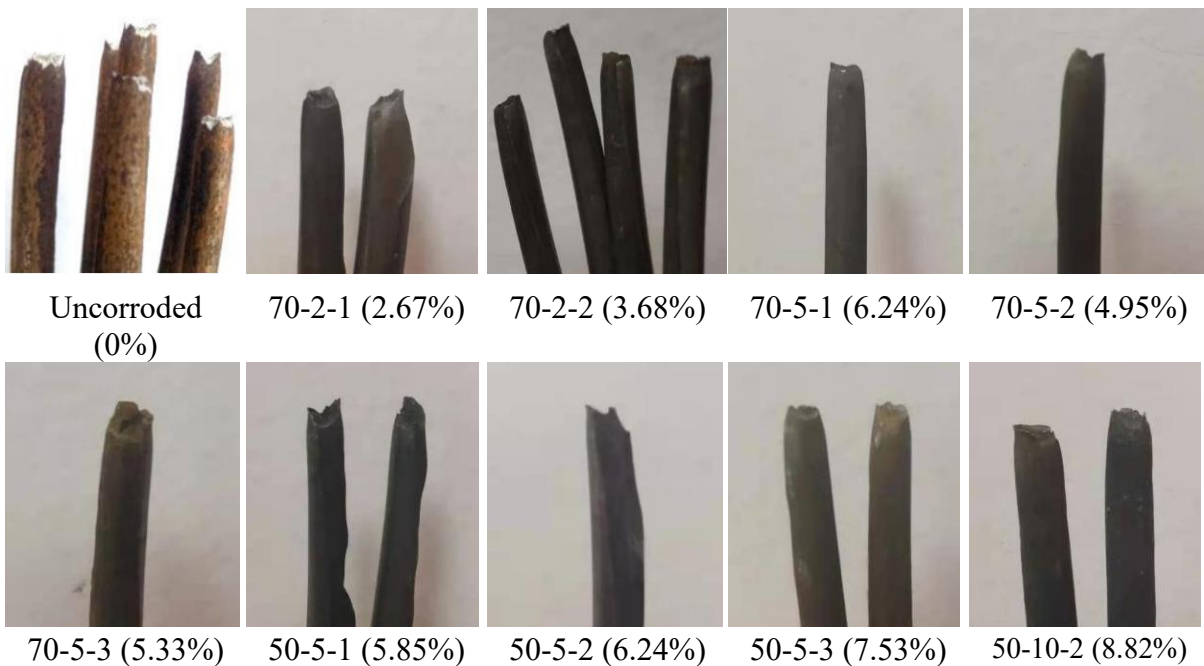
Fracture section of corroded steel wires after tensile loading test
